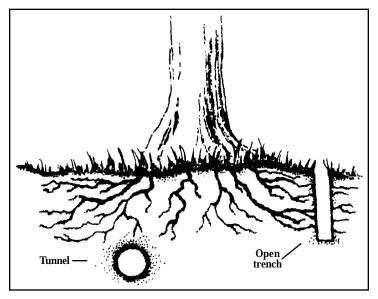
Tunneling below the root system is preferred over open trenching (on right) when installing the utility infrastructure near the protected root zone because tunneling impacts fewer roots and thereby increases tree survival.
